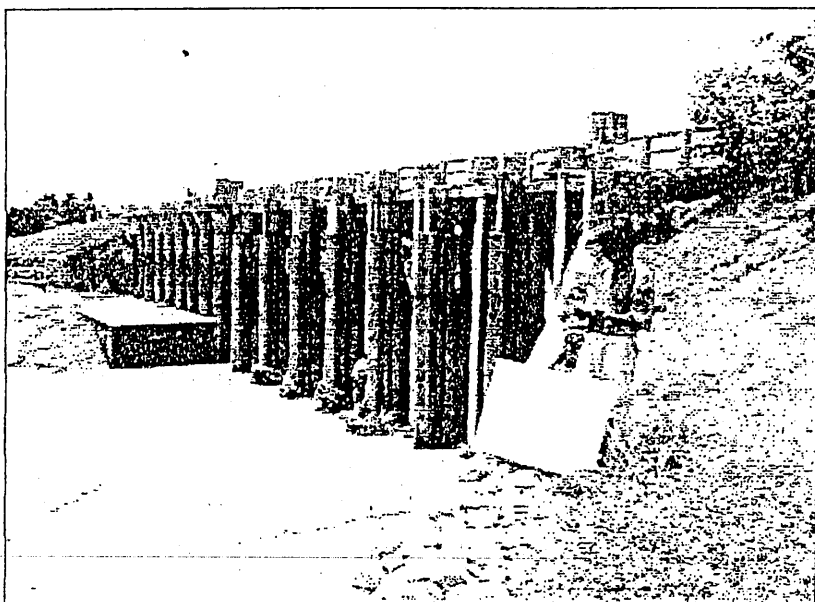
Slakou Regulator is a joint structure of NR3 Road Bridge
